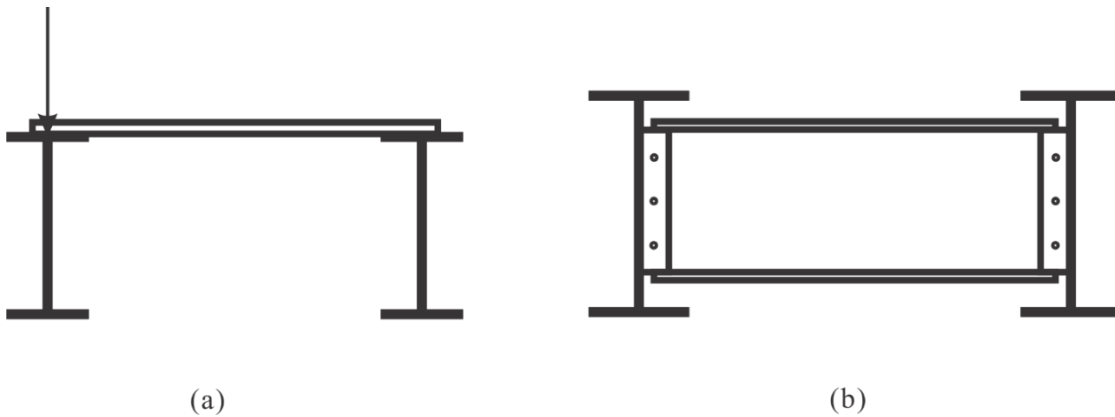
Beam bracing (a) lateral bracing (b) torsional bracing
